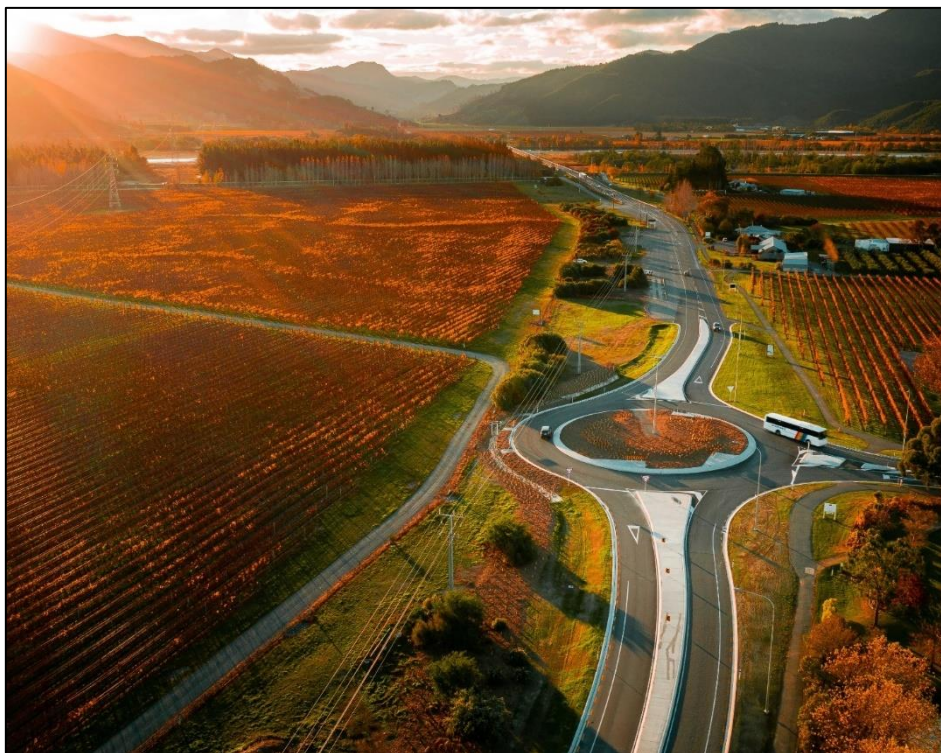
Completed Roundabout at SH6/SH62 Intersection
